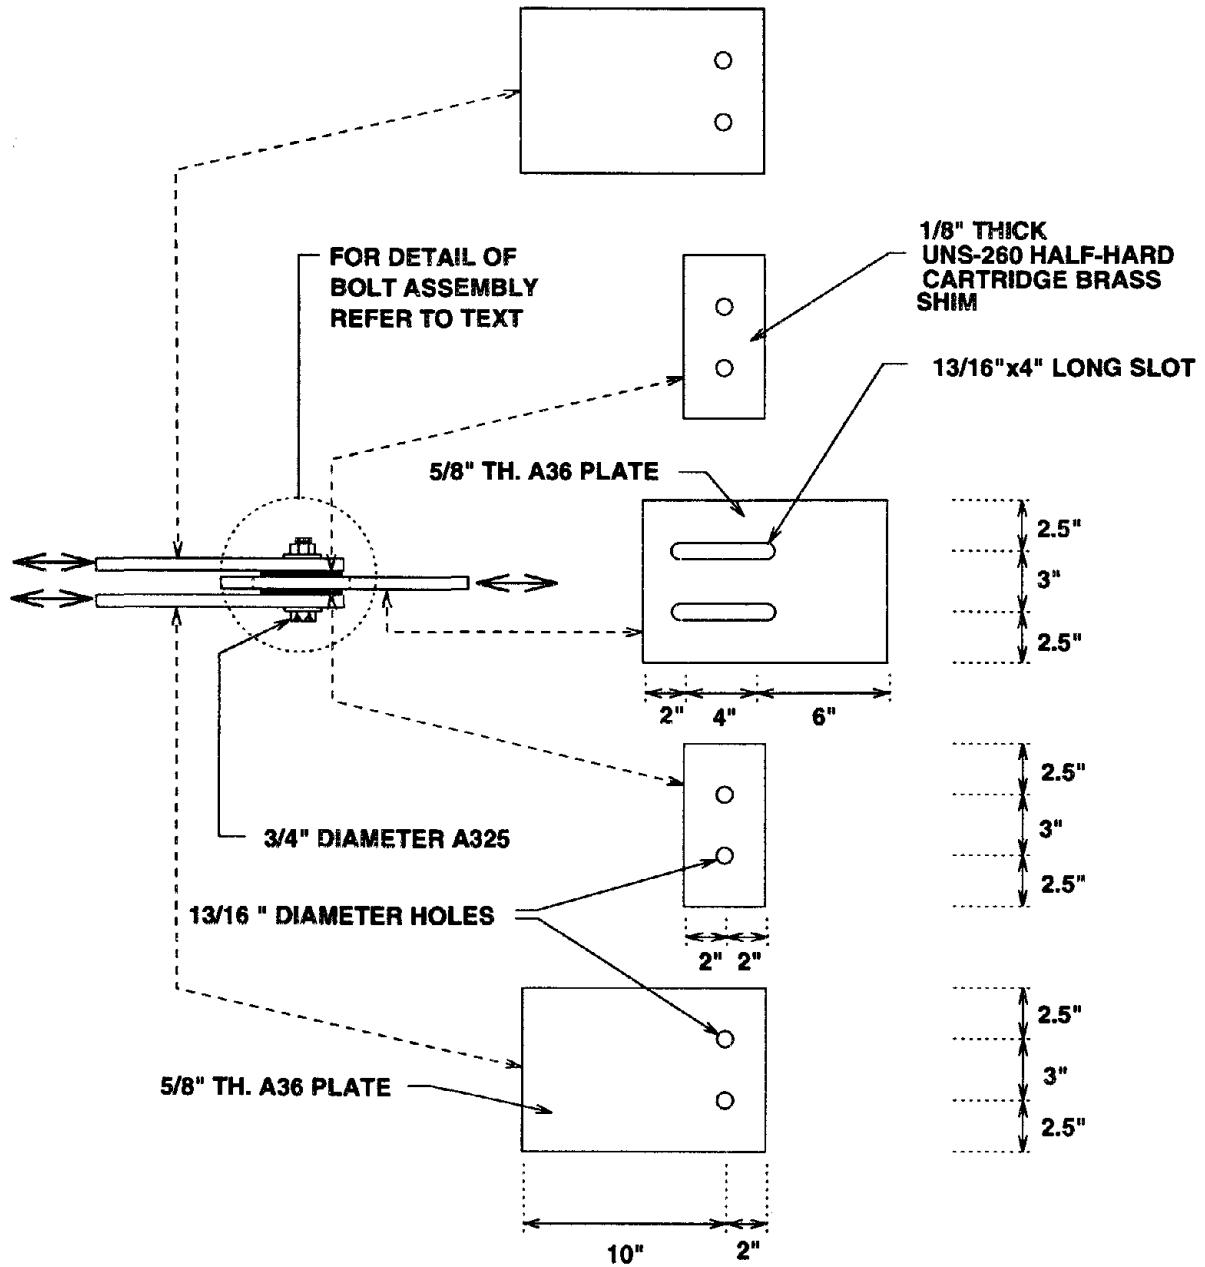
Typical detail of SBC test specimen with two $\frac{3}{4}$ inch diameter bolts.
